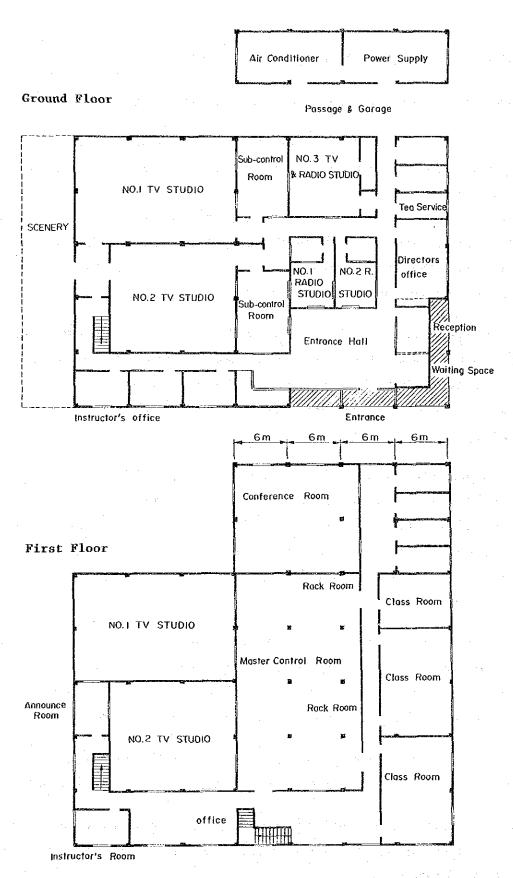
FLOOR LAYOUT OF TRAINING INSTITUTE
